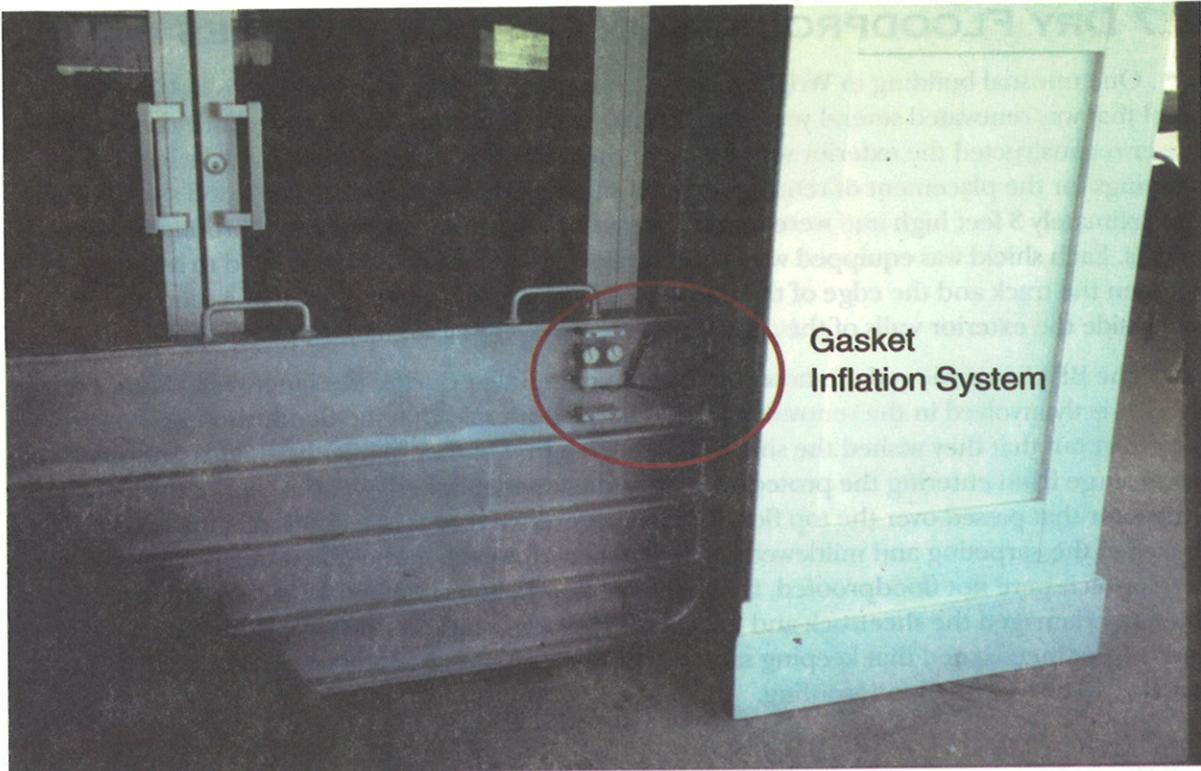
Buildings that are floodproofed require extensive engineering detailing. Note that this flood shield is sealed with a pneumatic gasket.
